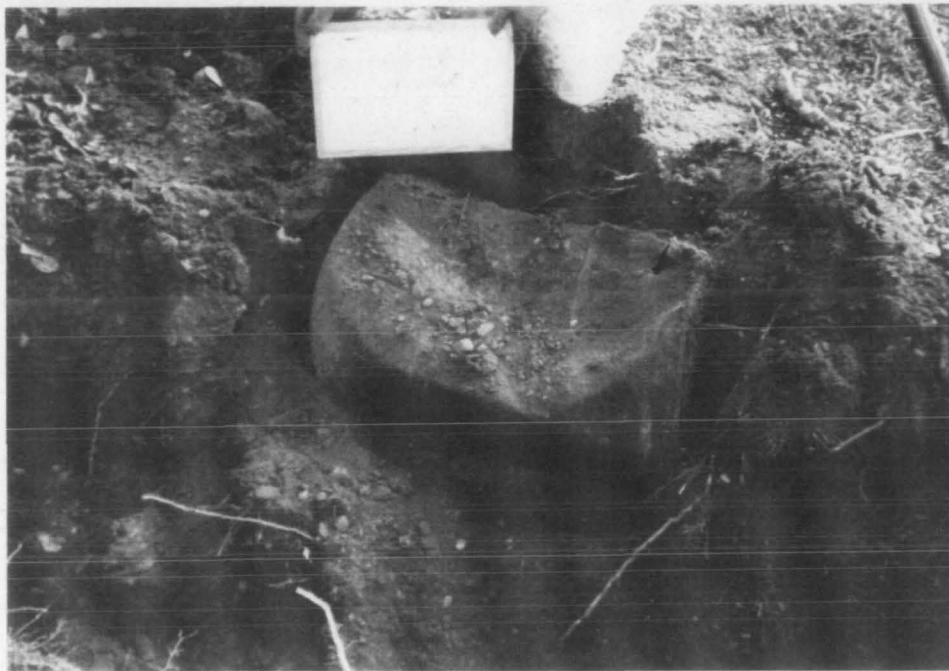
Test pit H showing drum (1/3 full of soil/tar mixture) exposed during excavation.
